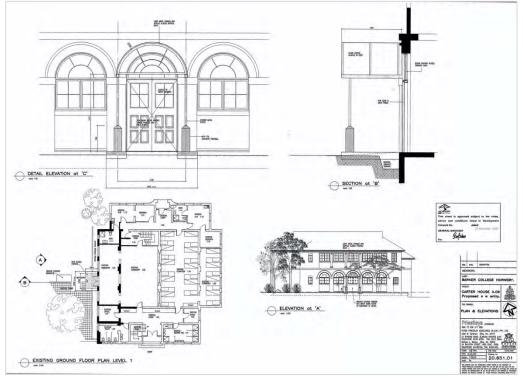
Approved and stamped plan, section and elevations for alterations to Carter House, prepared by Priestley's architects, dated 2 August 2006. (Source: Hornsby Shire Council, Online DA Tracker, DA/1826/2006, 91 Pacific Highway, Hornsby)
